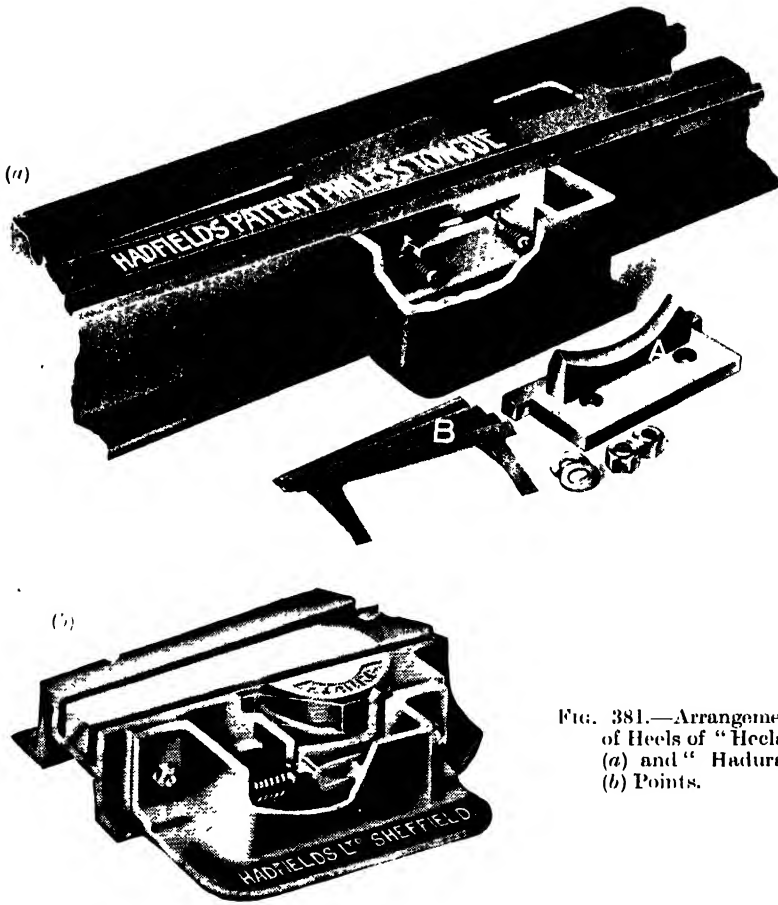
Arrangement of Heels of "Hecla" (a) and "Hadura" (b) Points.
